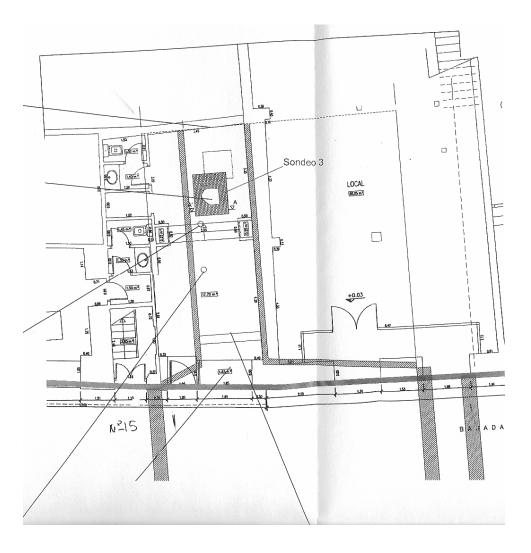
Ground Plan up-to-date of Carnicerías Bridge. (Author's plan)
